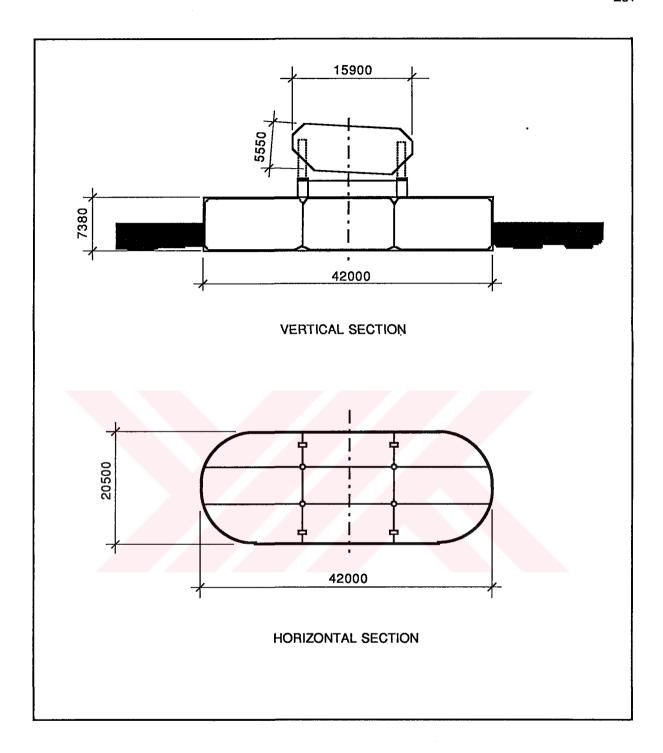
PONTOONS PLAN AND SECTION (in mm)
